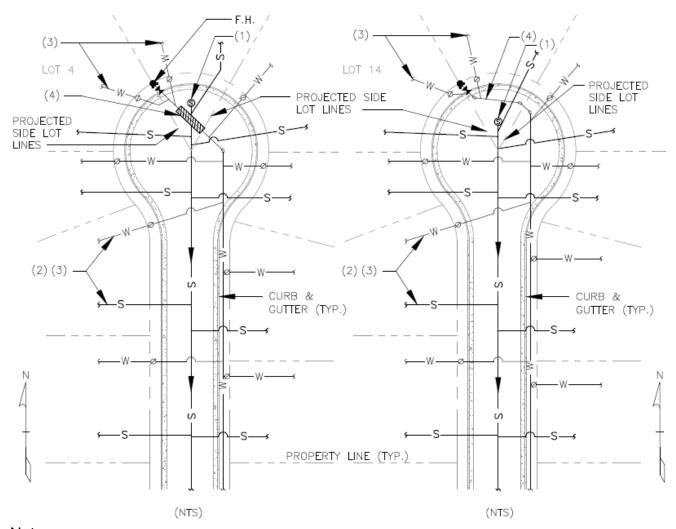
TYPICAL WATER AND SANITARY SEWER SERVICE LAYOUT
